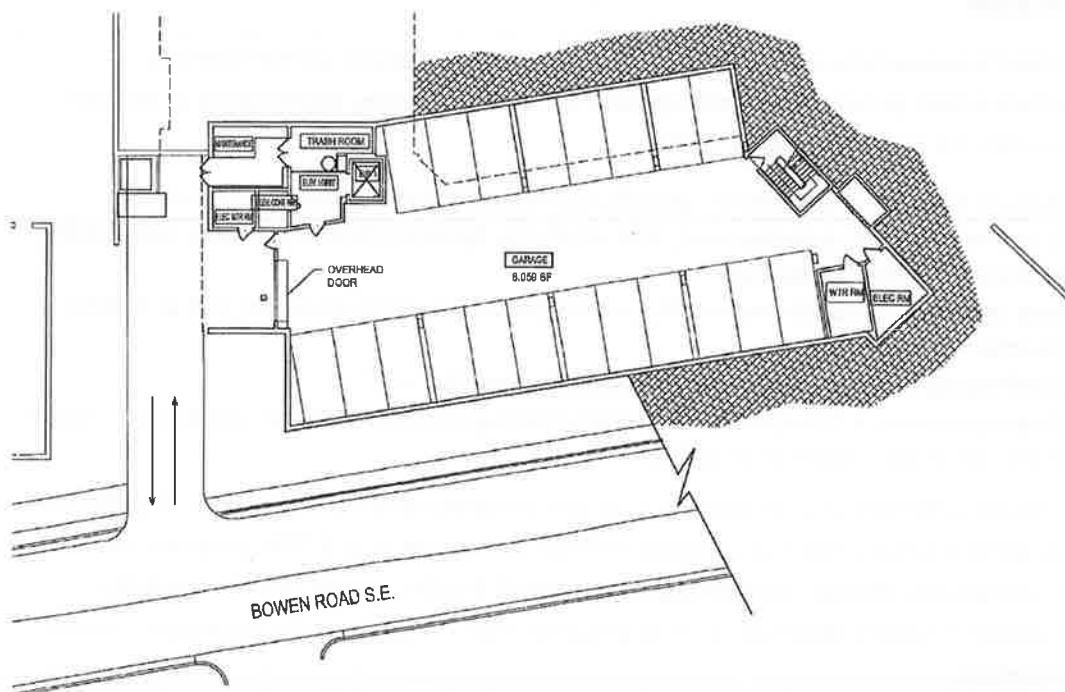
Proposed First Floor Building Layout (Source: Applicant)
